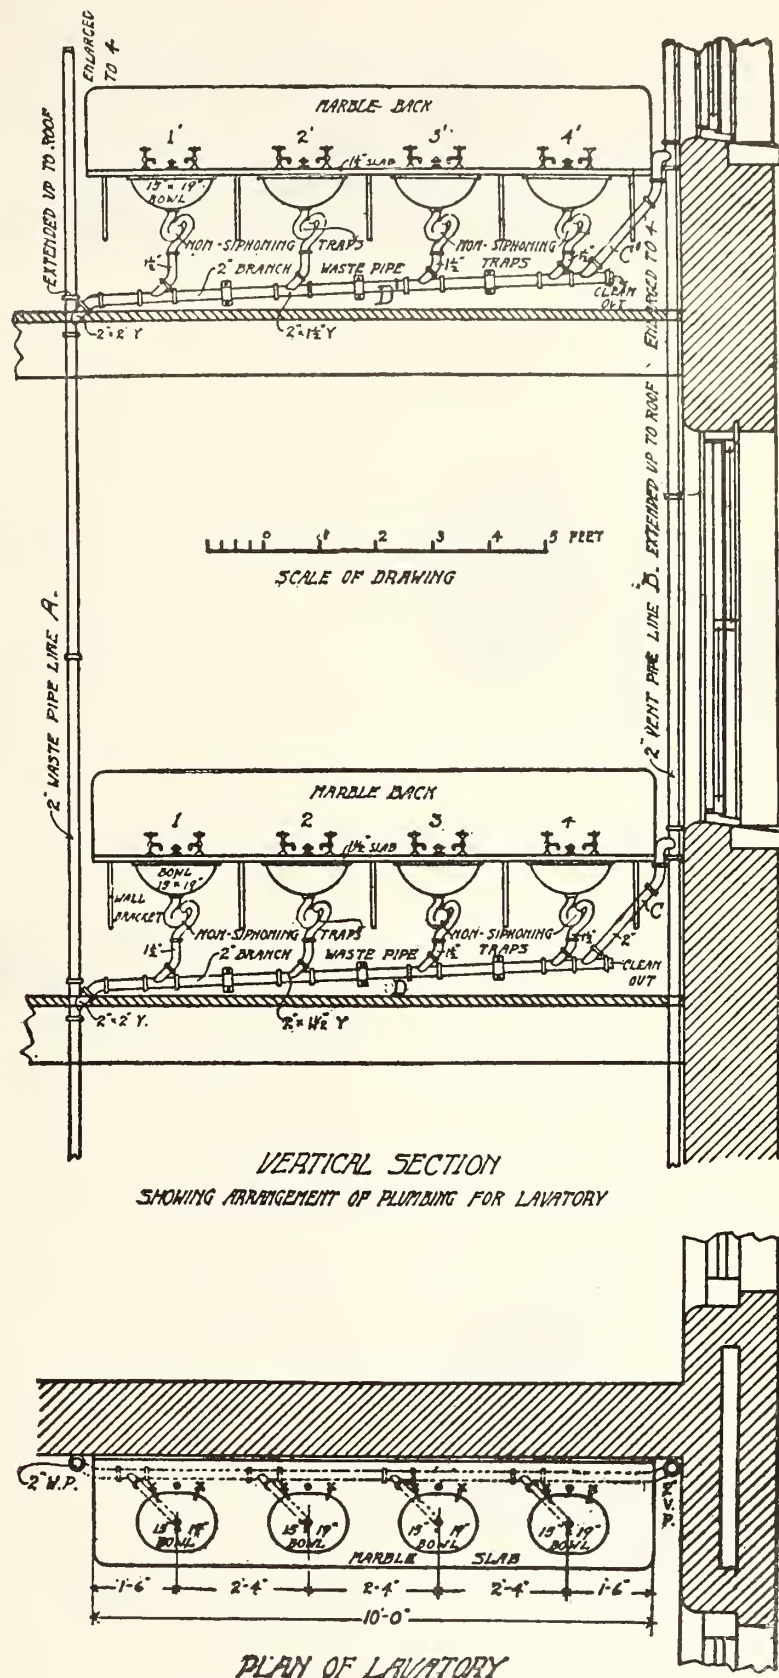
Plan and section showing simplified plumbing for a group of lavatories.
